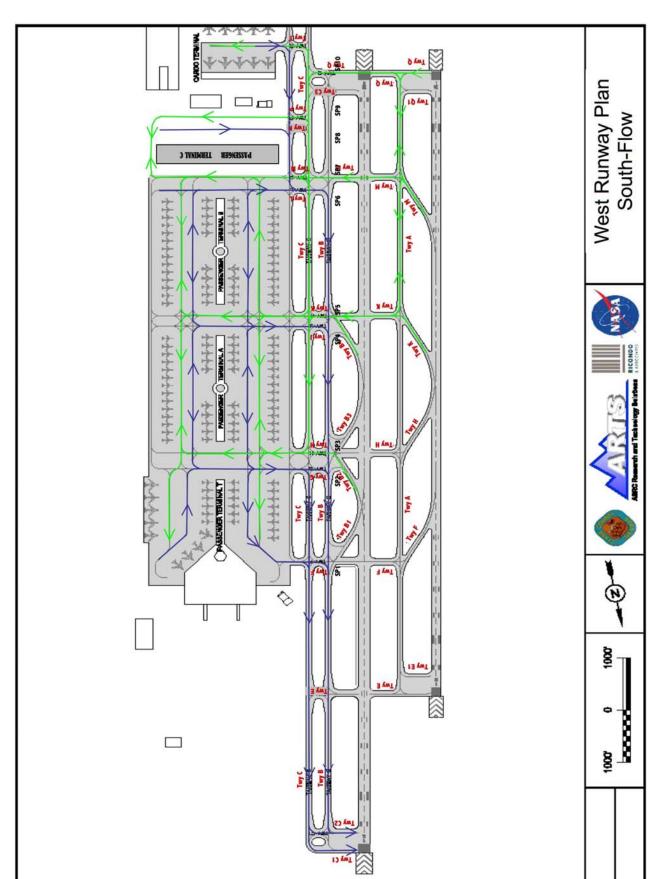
Taxiway Diagram - West Runway Plan, South-Flow
